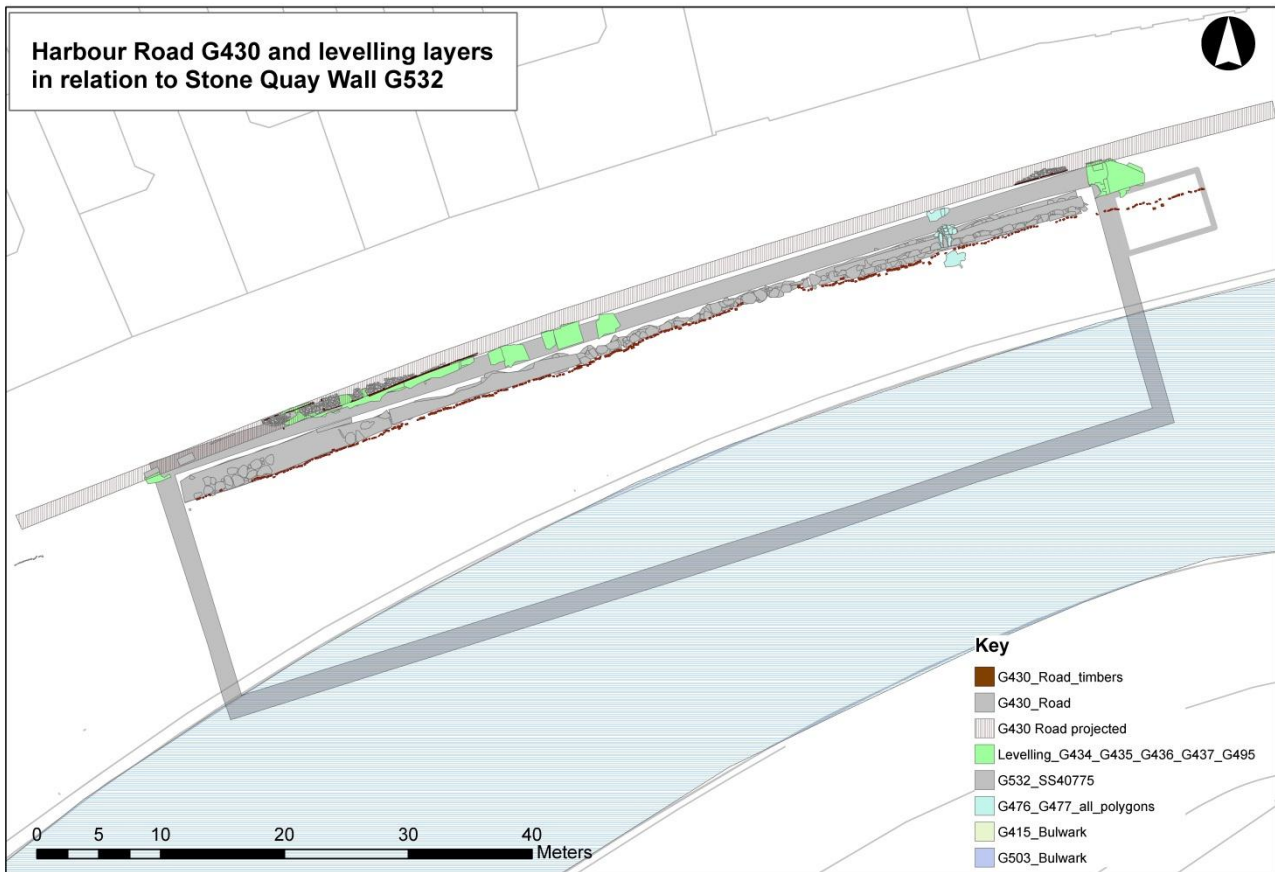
Plan showing, wall G532 and behind the wall, levelling groups and the road G430
